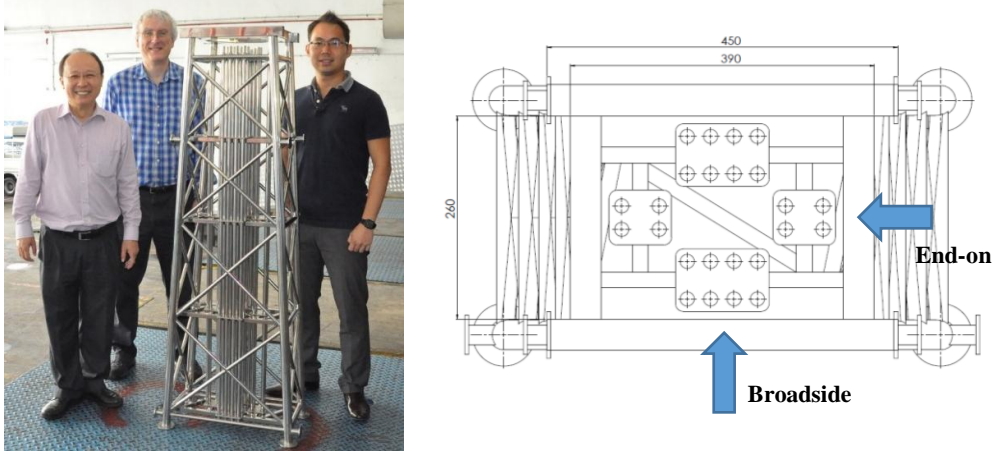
(Left) 3D view of the jacket model and (Right) plan view of the model showing the arrangement of conductor arrays.
